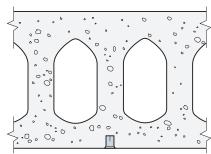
Hollow-Core Concrete Panel (anchor can be installed below web or hollow core)
